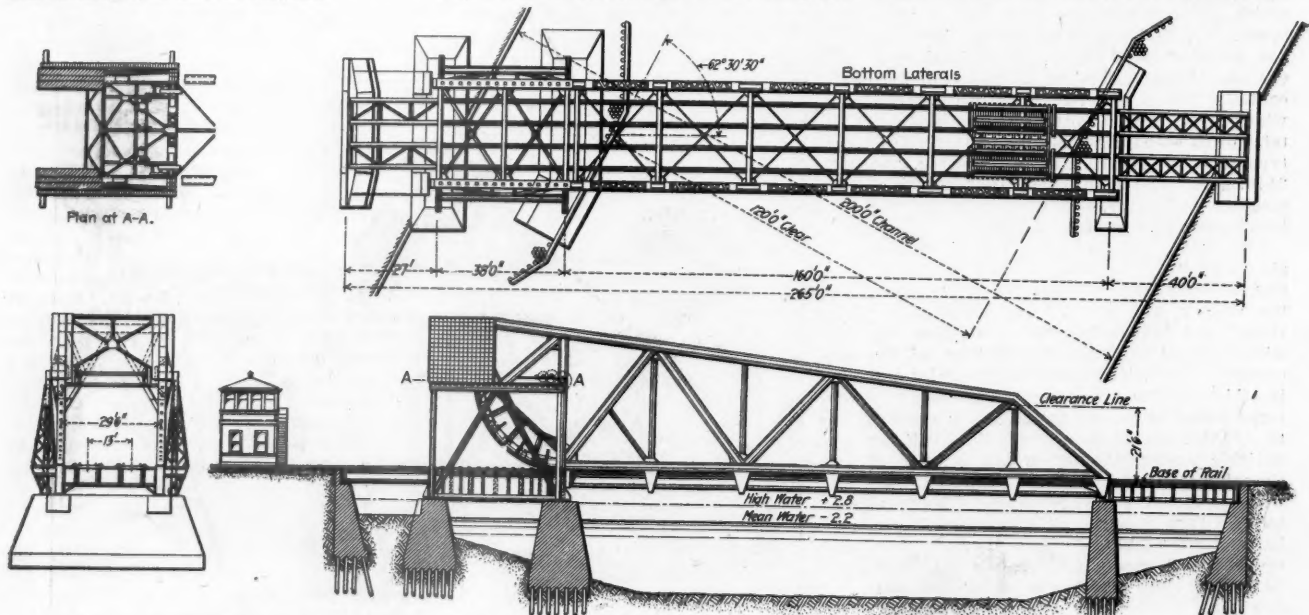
Plan and Elevations of 160-ft. Span Scherzer Rolling Lift Bridge, Newburgh & South Shore.
